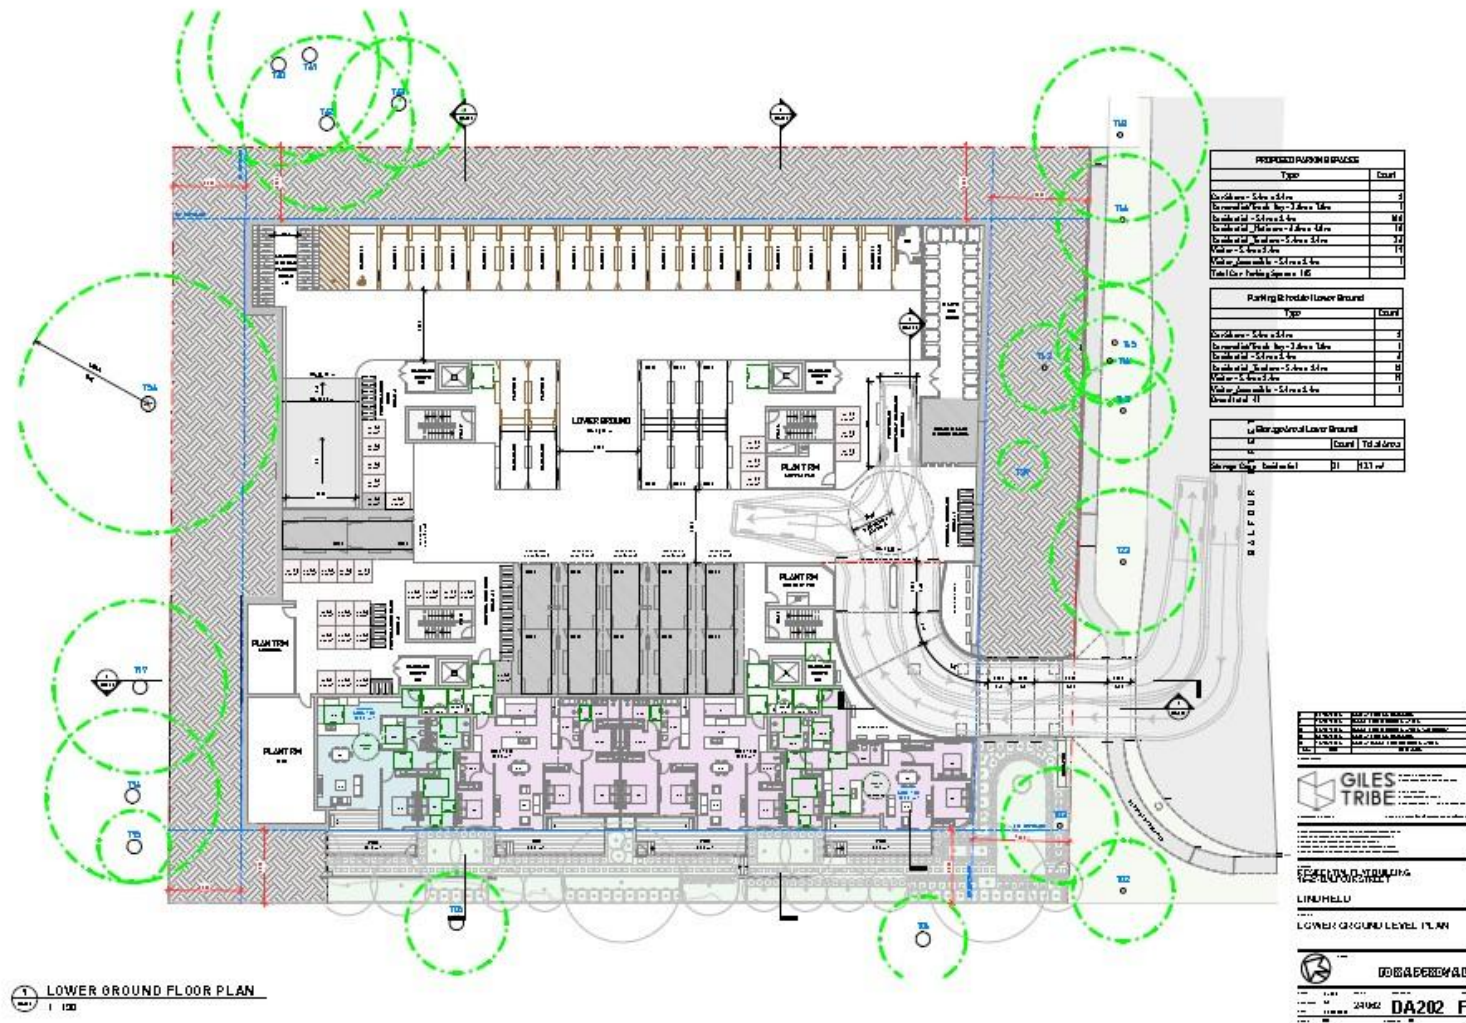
Lower Ground Floor site plan for proposed apartment building at 19 – 25 Balfour Street, Lindfield (for detail see Giles Tribe Architects 2026), note building footprint does not encroach on the TPZ of any significant trees (from A Scales 2026)
